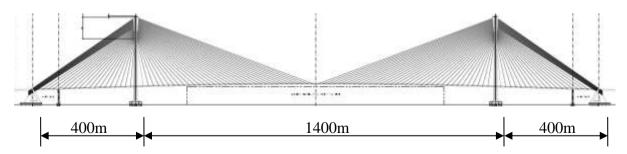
Generally arrangement of the partially earth anchored cable stayed bridge
